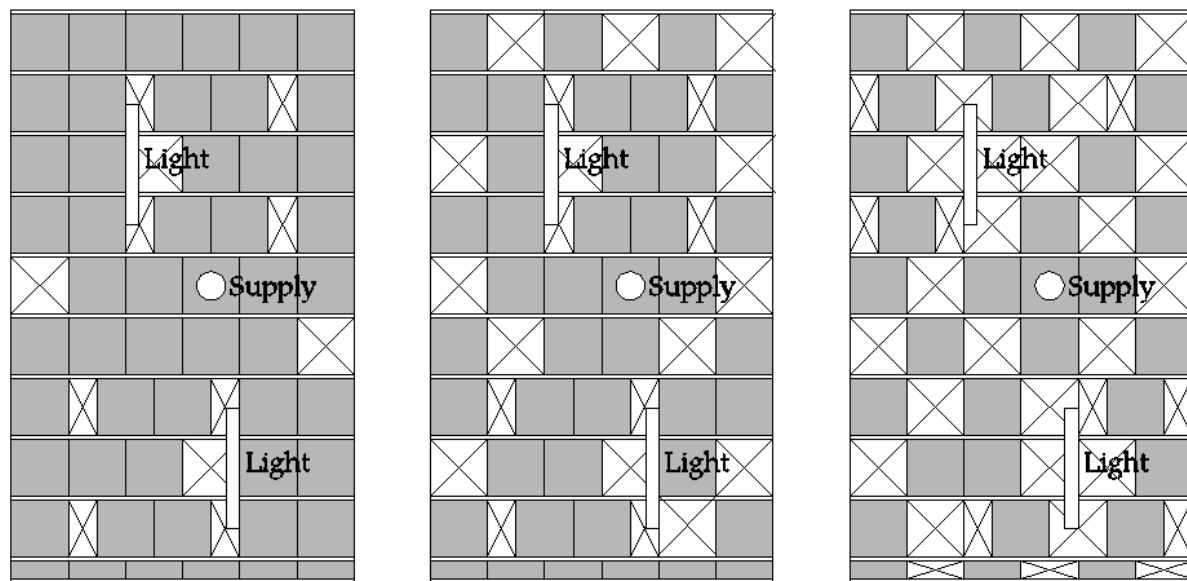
87%, 70% and 53% suspended ceiling covering layouts
